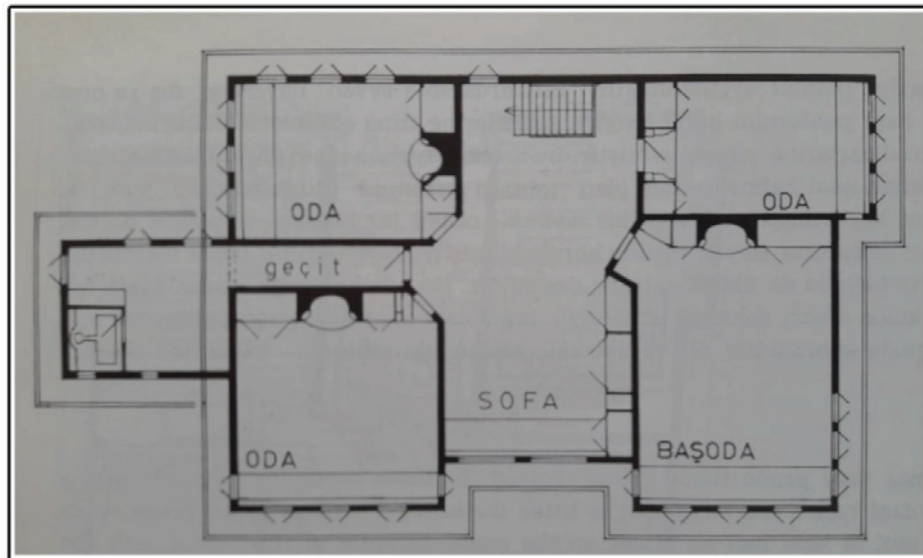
Second floor plan of Izmit Fazıl Pasha Mansion.(Source: Eldem 1984, p.154)
